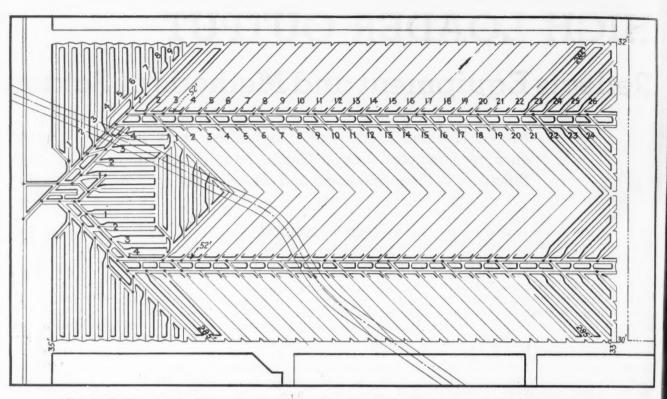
Working panel. All panels are similar. Note heavy pillar to protect mouth of straightway entries.
